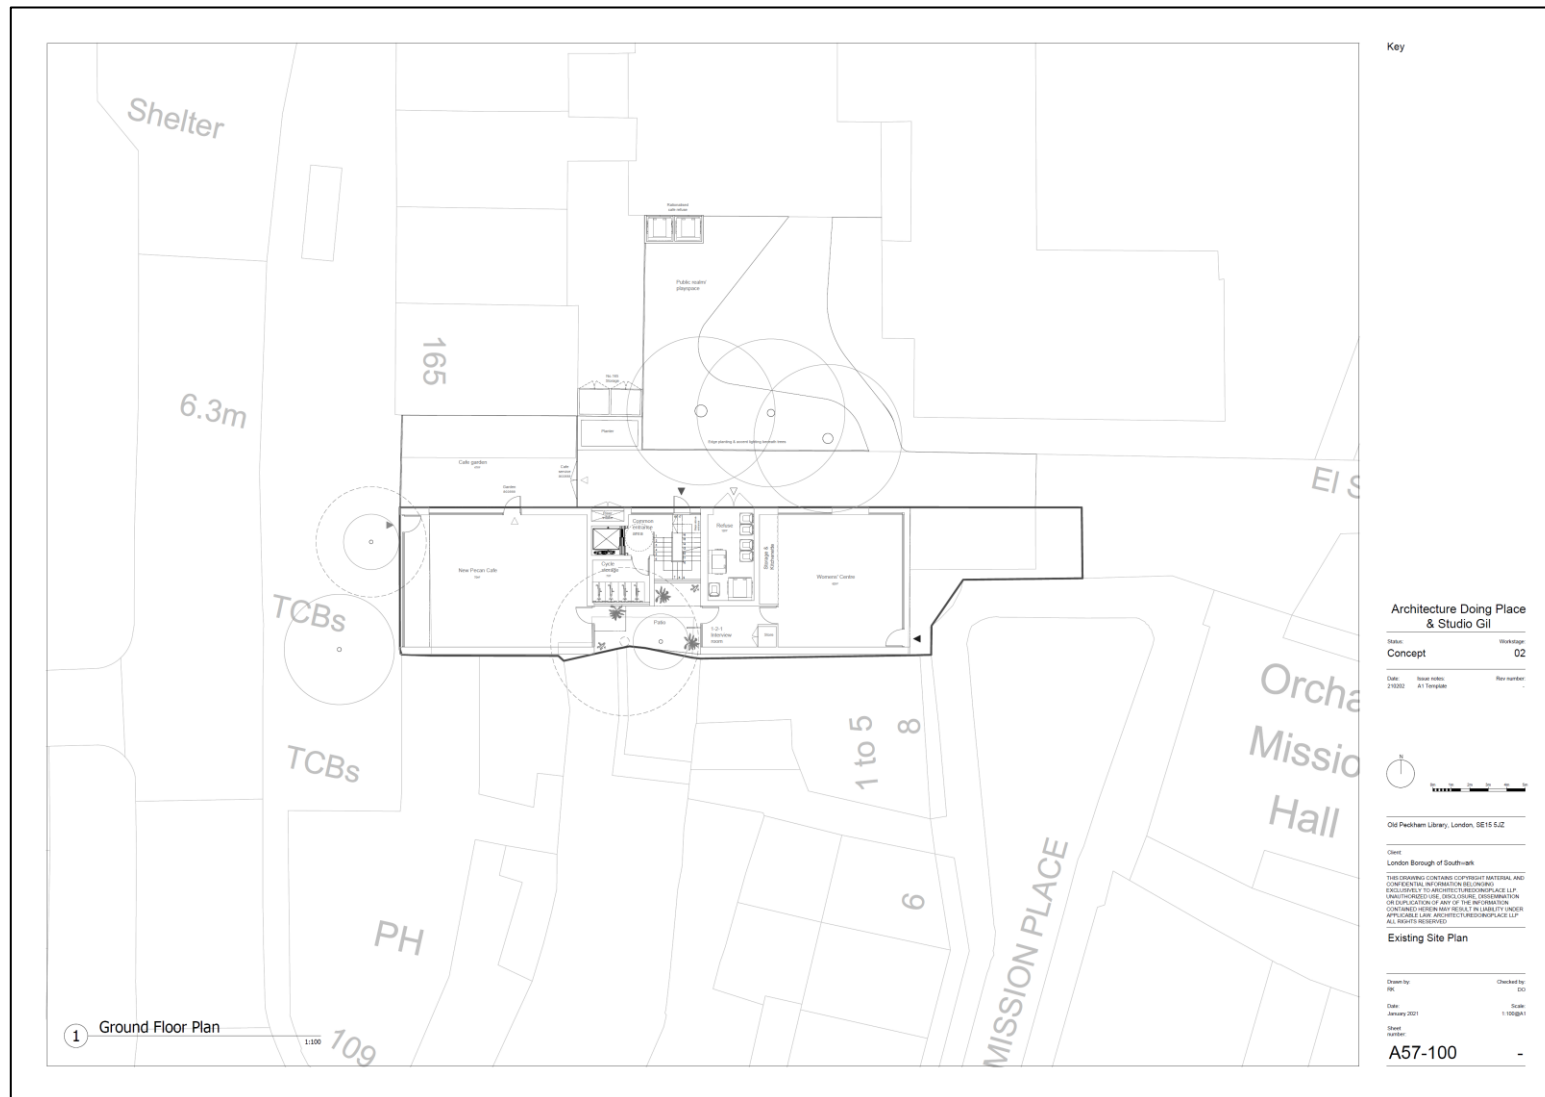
Proposed ground floor plan (Reproduced by courtesy of the client)
